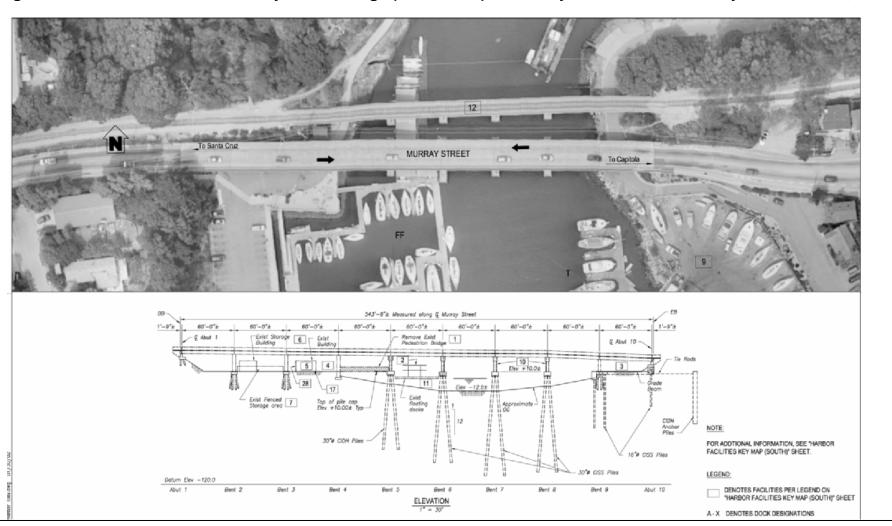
Cross Section of the Murray Street Bridge (# 36C-0108) in the City of Santa Cruz, County of Santa Cruz, CA
